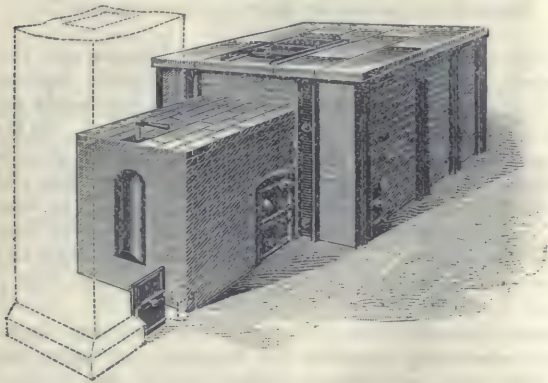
BACK VIEW OF ORDINARY FORM OF INCINERATOR SHOWING THE AUXILIARY FURNACE.
